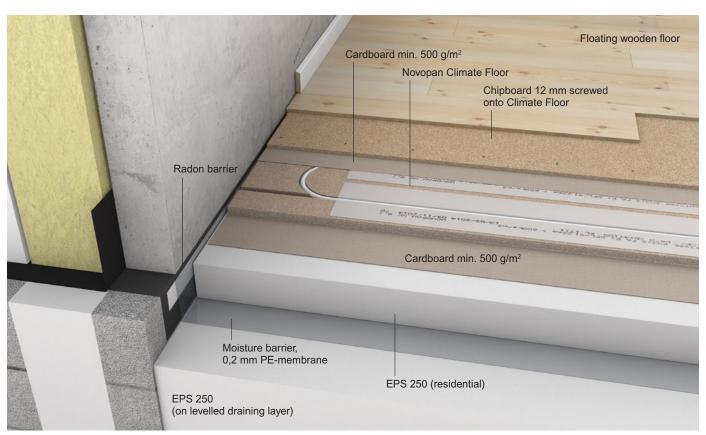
Novopan Climate Floor laid floating on a ground deck of EPS insulation and finished with a floating wooden floor.
